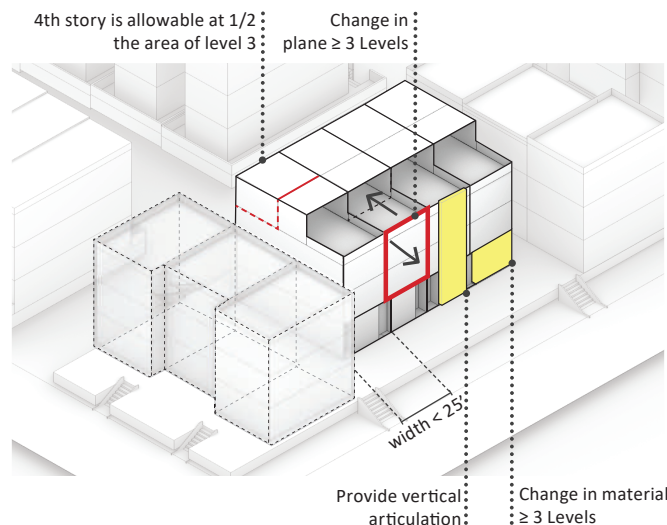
BUILDING MODULATION & ARTICULATION
